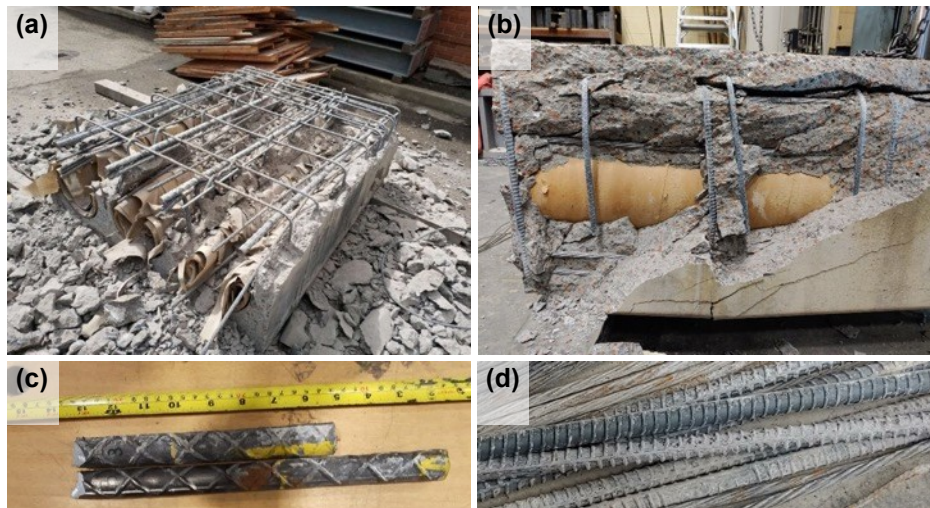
12: (a) Extraction of rebar from Girder LD (b) Failed Girder MD with both types of bars visible (c) ‘X’ ribbing in Girder LD’s 25M bars and (d) ‘bamboo’ ribbing on 25M bars from other girders.
